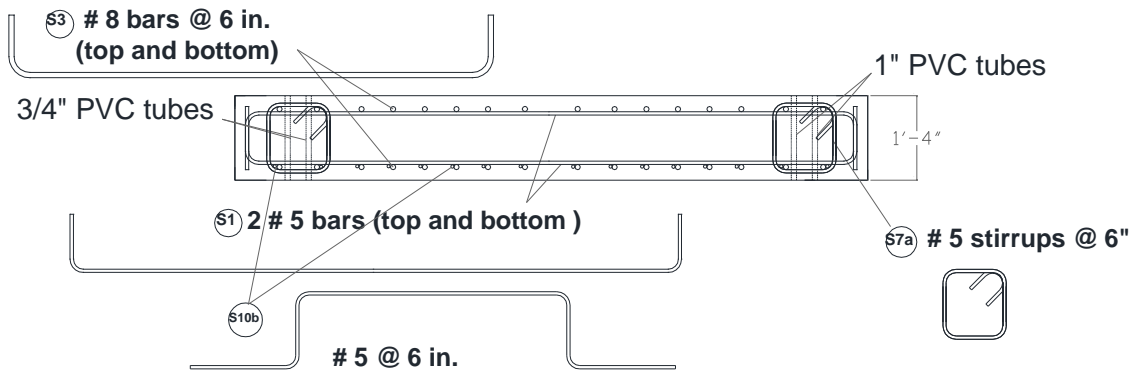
Elevation view of slab reinforcement at Section BB for Specimen #3
